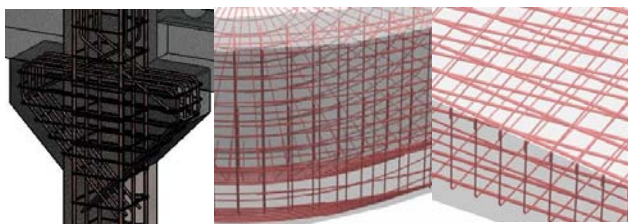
From left to right (a) Corbel reinforcement design in Revit Structure, (b) Allplan Engineer reinforcement modeling in circular (c) sloped polygonal element
